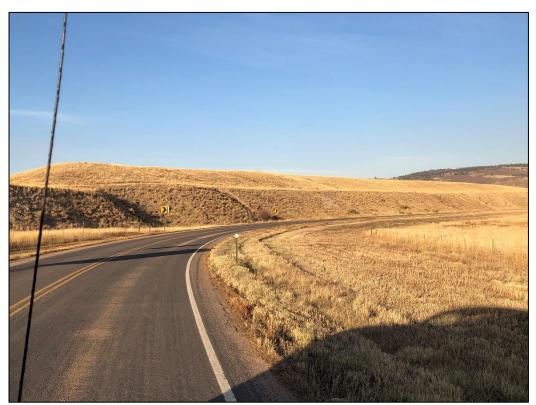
View looking northeast at large overburden stockpile stored along southern edge of mine, north of Vestal Rd. Note this side of the pile has good grass cover.
